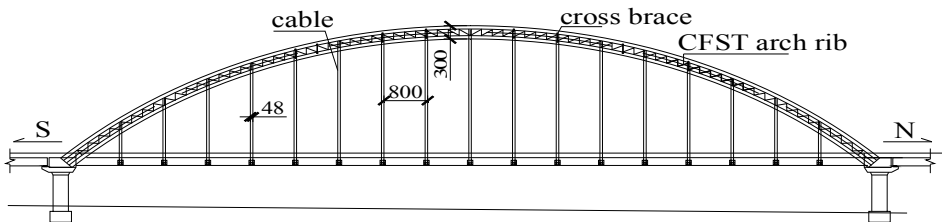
General arrangement of the Rigid-frame tied through CFST arch bridge (unit: cm).
